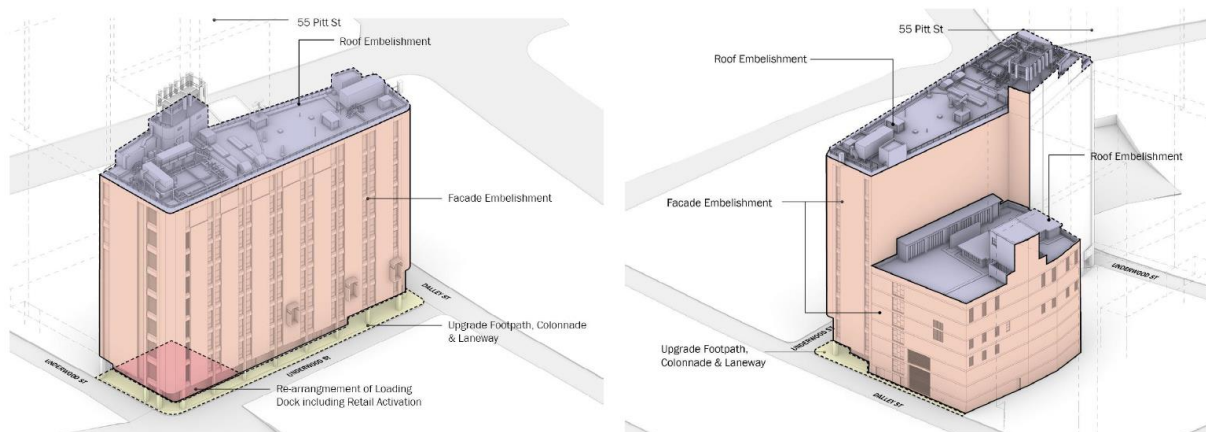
Proposed scope of works to existing Telstra and Ausgrid utility buildings
